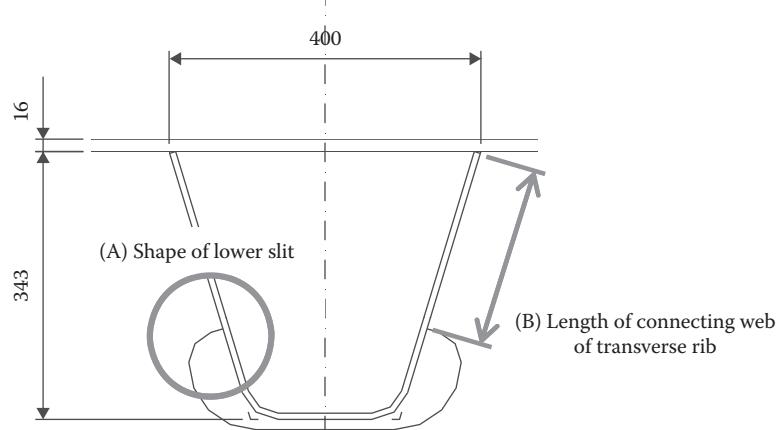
Basic design of orthotropic steel bridge decks for Tokyo Gate Bridge.
